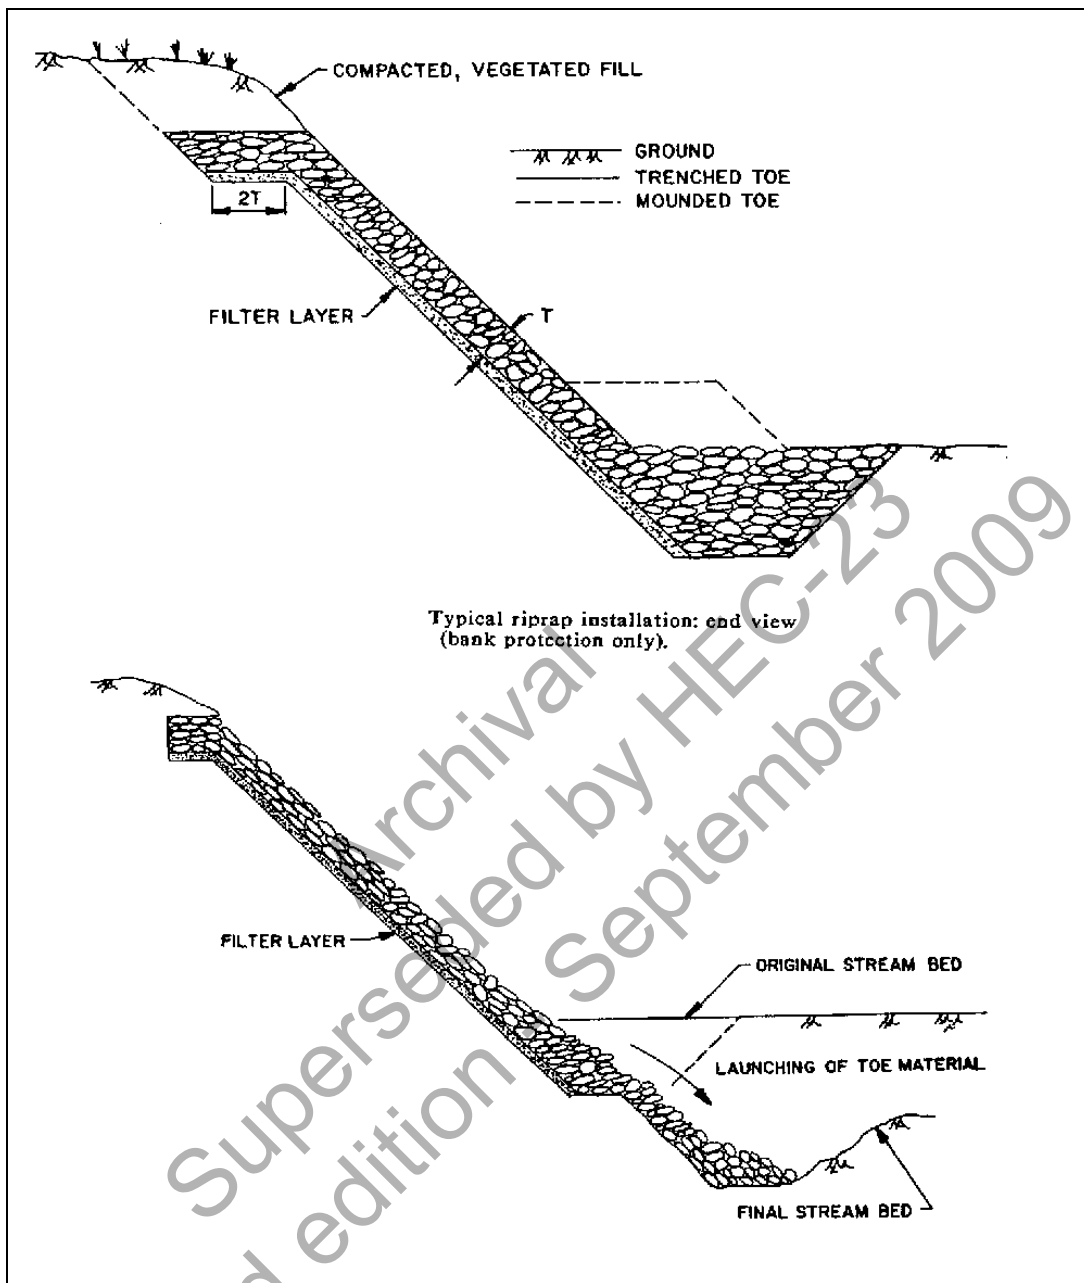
Alternative method of providing toe protection.⁽¹⁾
